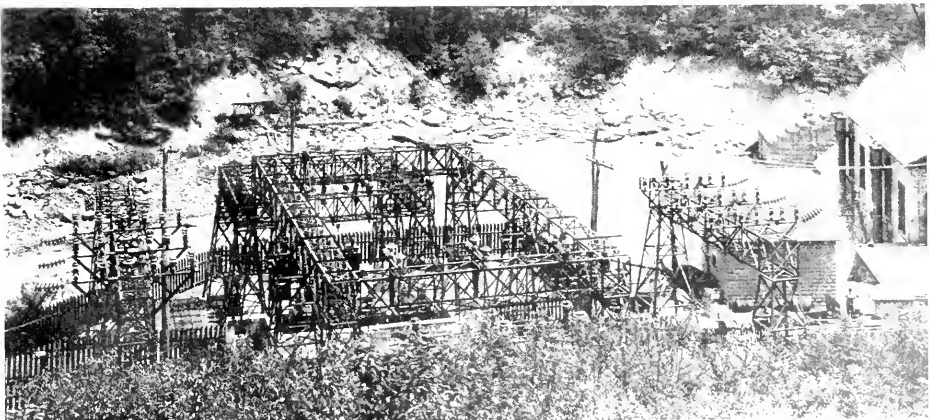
OUTDOOR TIE-IN SUBSTATION AT ELLWOOD CITY
